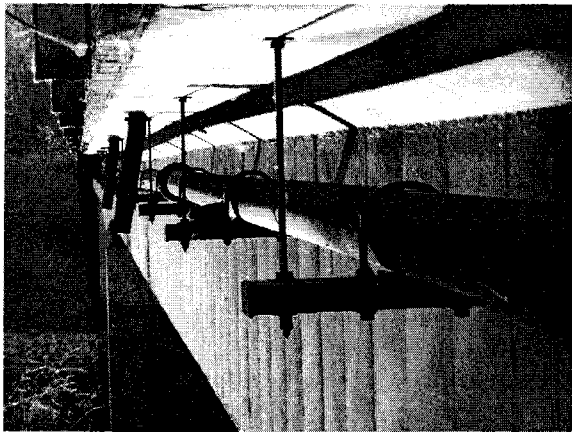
Washougal River Bridge Crossing: View of as found condition of pipe supports.
